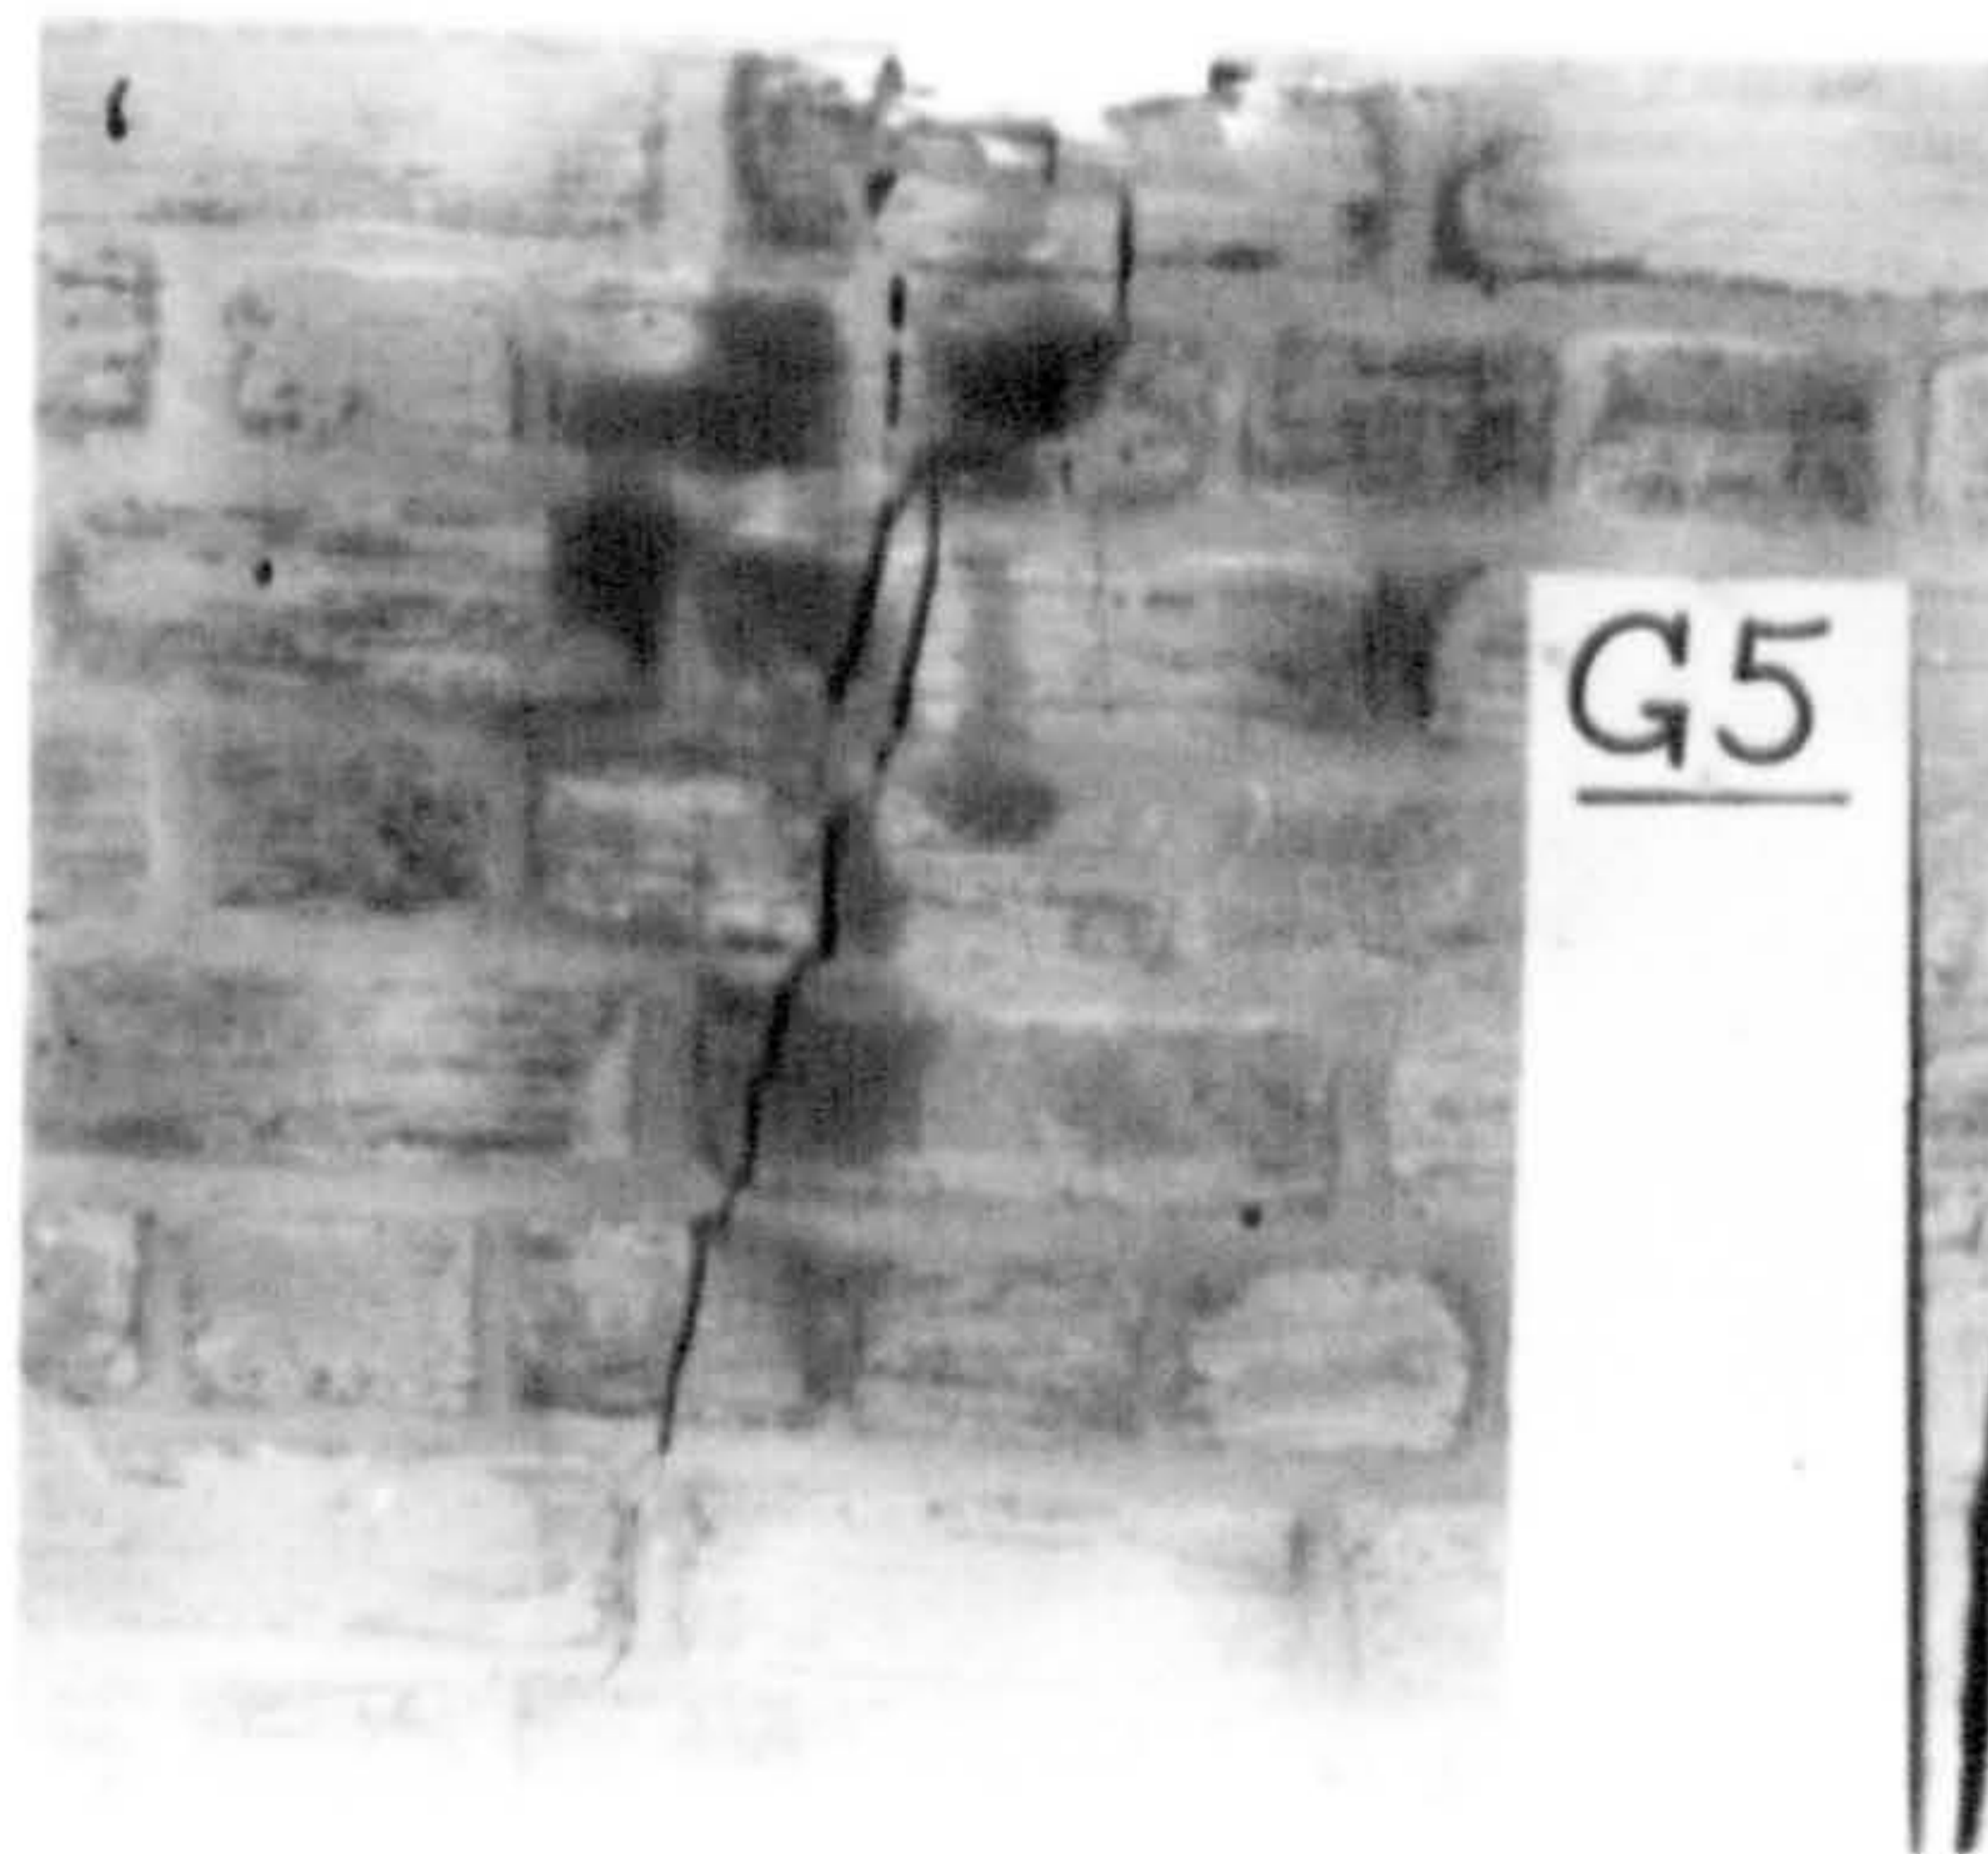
Typical failure mode and crack pattern for brickwork type G under central strip loading ( $t=102.5\text{mm}$ ).
